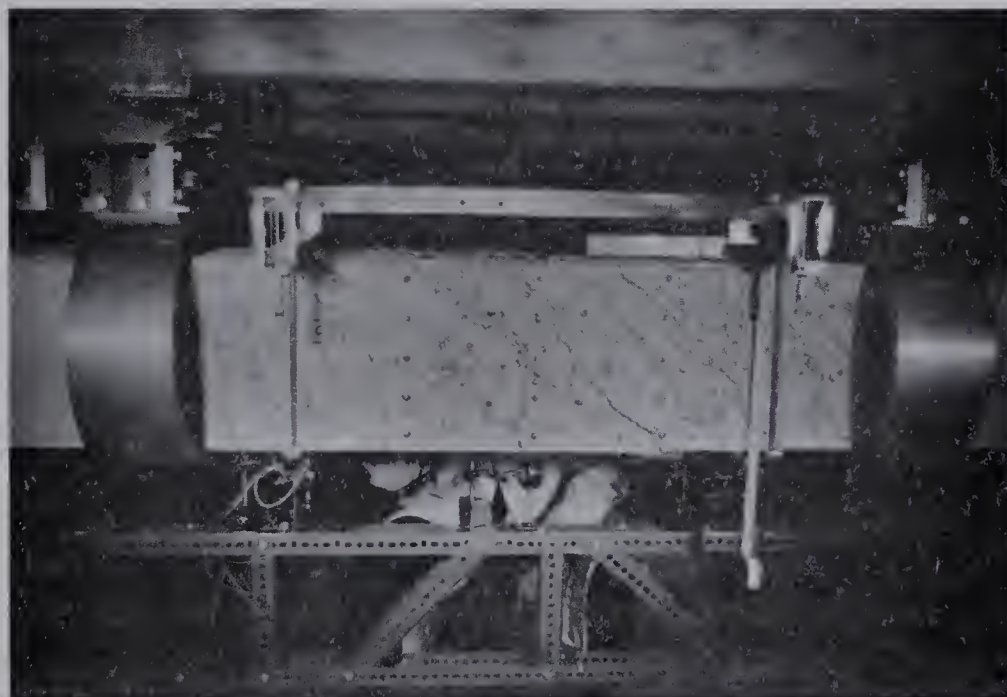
CRACK PATTERN FOR NORTH FACE OF BEAM C-2
